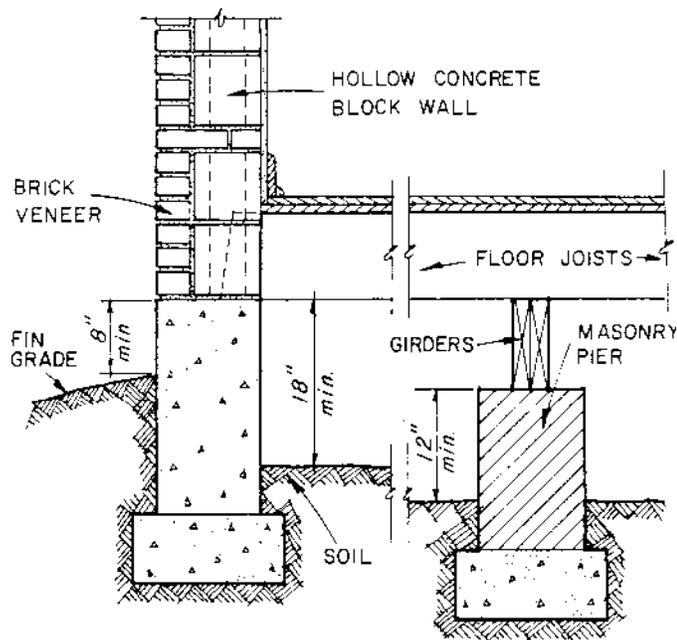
Where the superstructure of a building is masonry, provide for adequate clearance between wood and ground both outside and inside the building (adapted from USDA).
